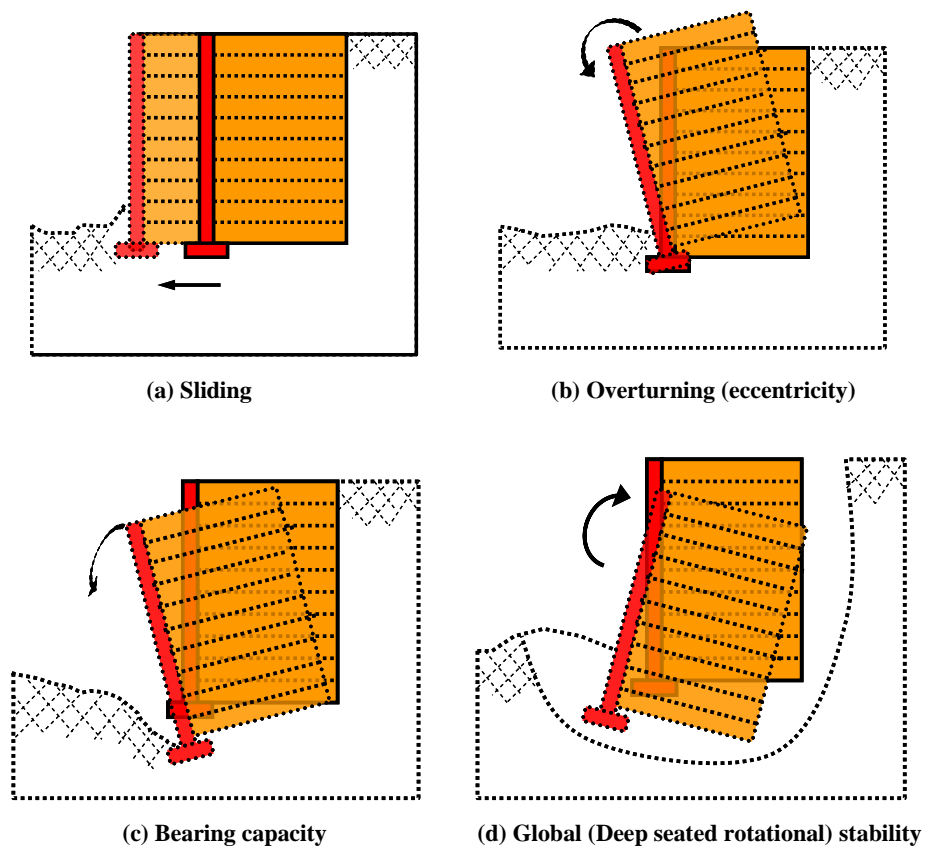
Potential External Failure Mechanisms for MSE Walls
